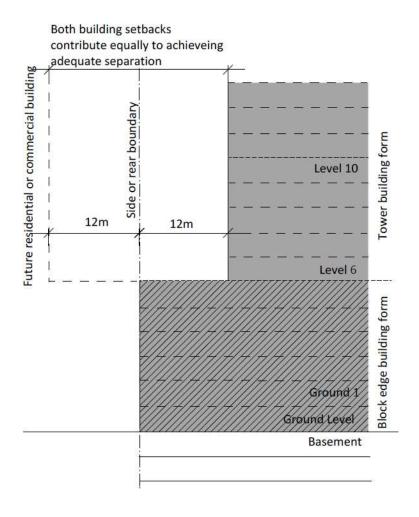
Elevation - Side and rear boundary setbacks to prevent overlooking
